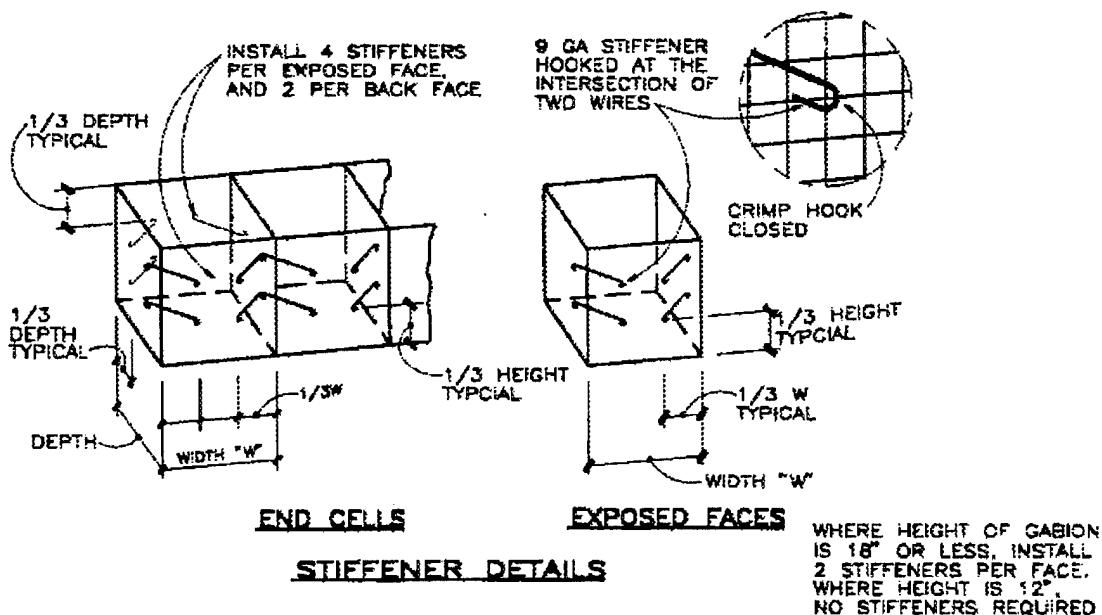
Stiffener installation to prevent bulging faces (courtesy Hilfiker Retaining Walls)
